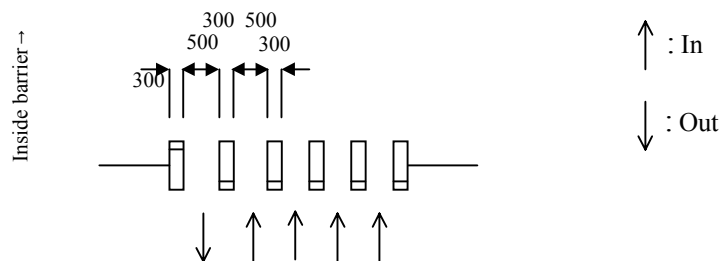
Preliminary Plan of Automatic Barrier (existing facilities dimensions)
